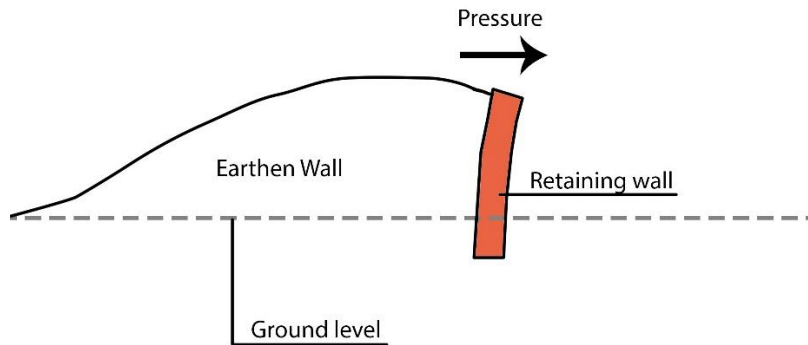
, schematic representation of the earthen wall's mass causing the brick retaining wall to lean away from the earthen wall. By author.
